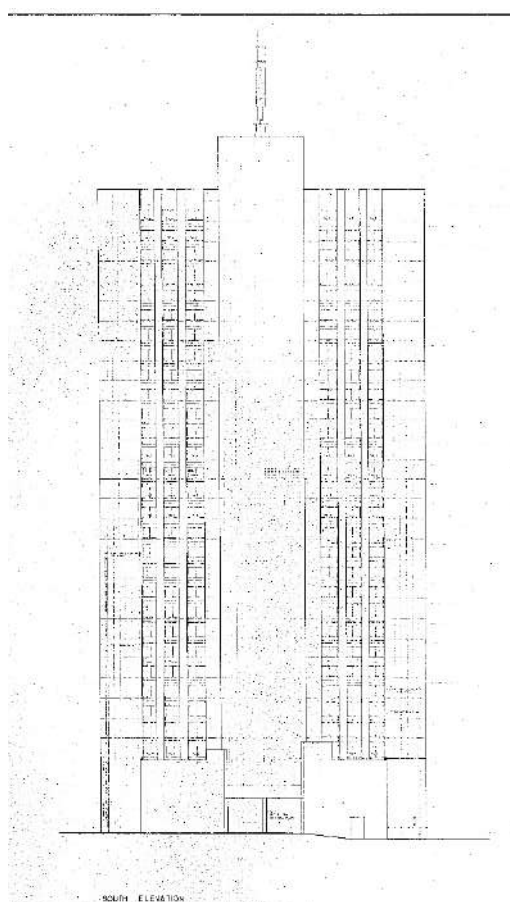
Architectural drawing of the south elevation, dated 1969 (BAP).
